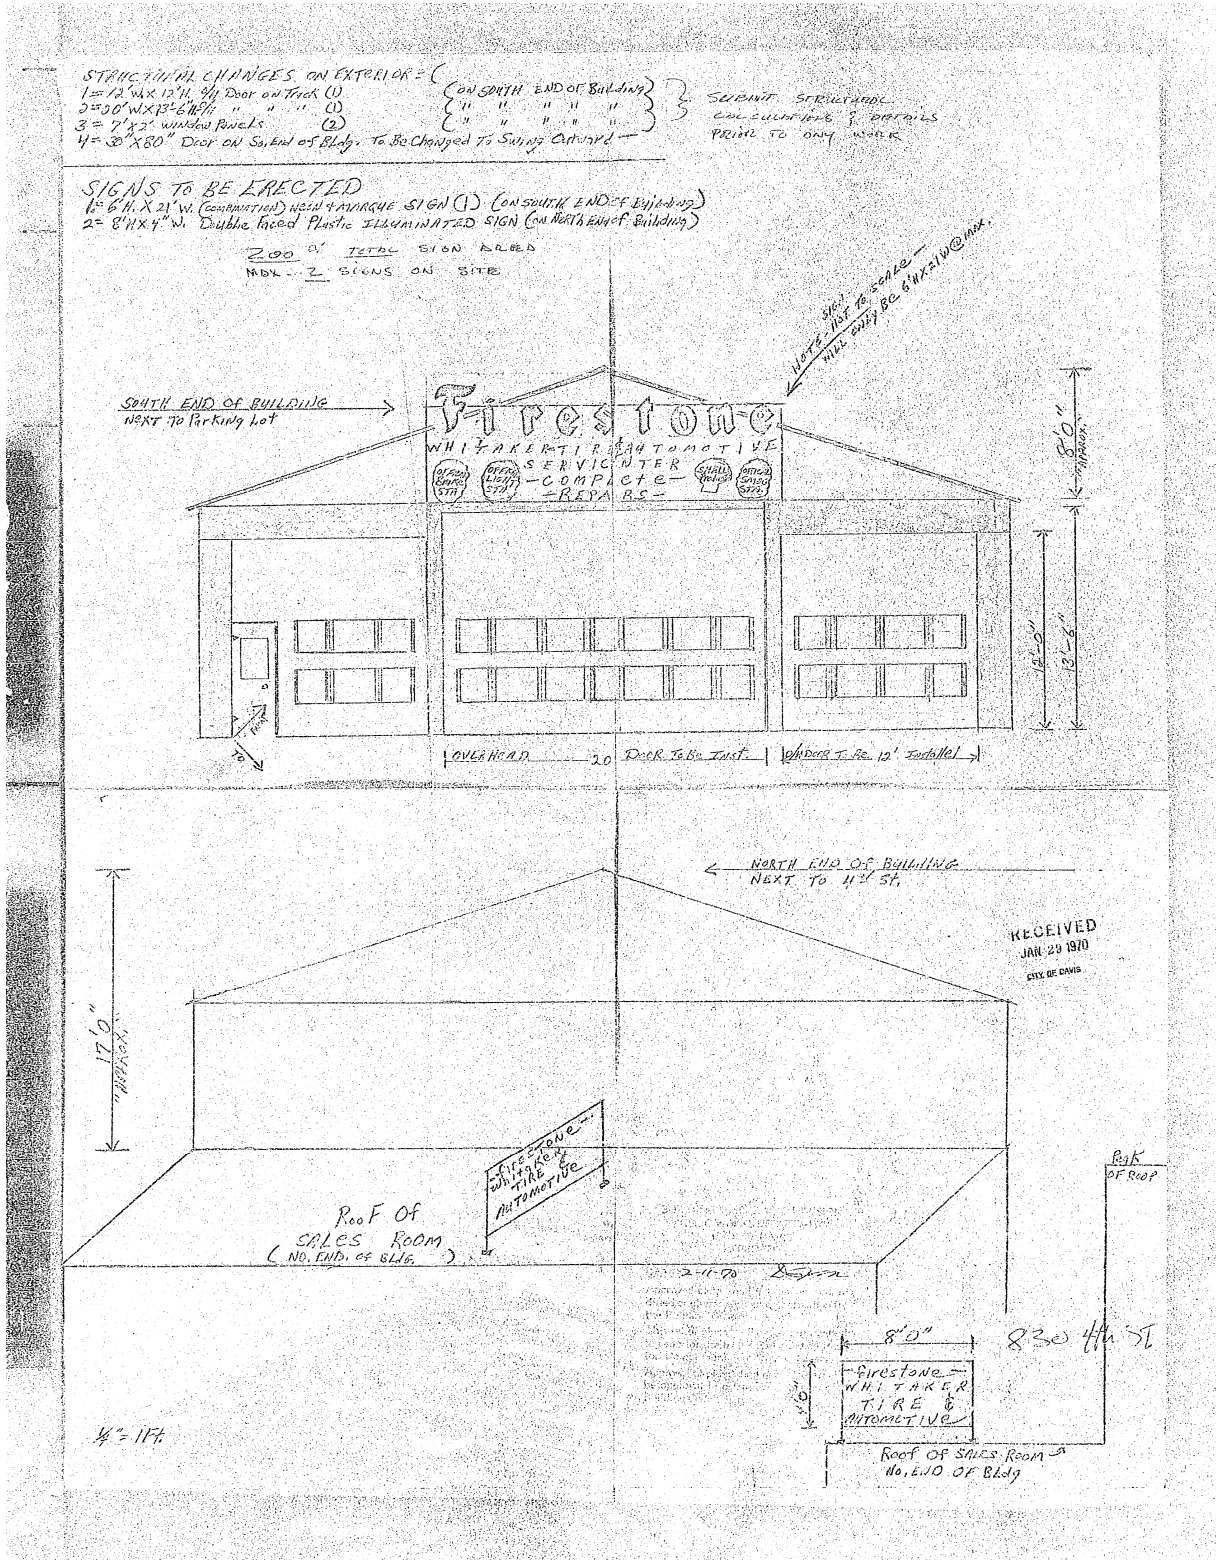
1970 Elevation drawings for Firestone Tire Shop.
